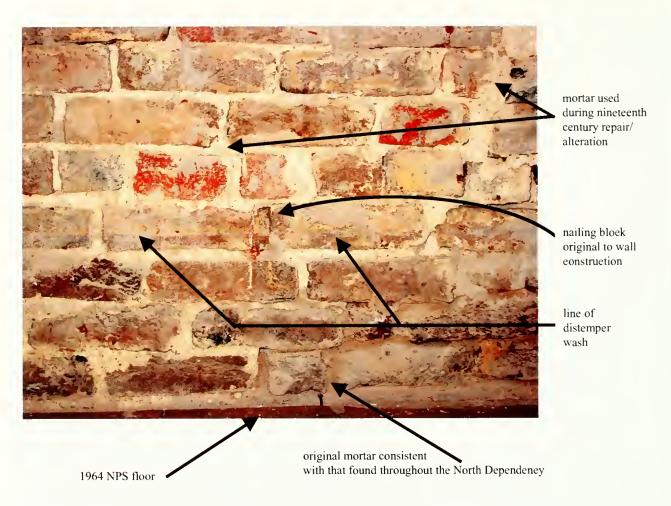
Center room, close up of north wall, 2003, Showing nailers and line of bright yellow distemper wash. It appears that the nailers provided a means of anchoring a baseboard to the wall above the floor. The distemper probably marks a line corresponding to the upper edge of the baseboard. Brick above the line would have been covered with plaster; brick below the line would have been concealed beneath the baseboard. Evidence of distemper on brick is similar to that found on the south wall of the east room, North Dependency (see Figure 12).
